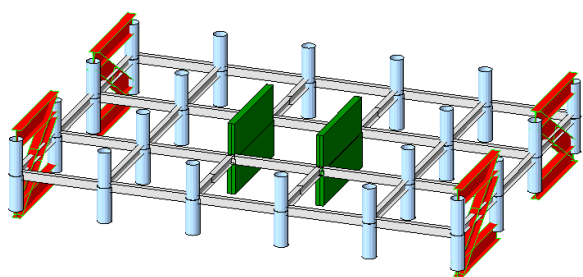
Layout type 2 of offset outrigger system(Outrigger is installed in line 1 and 6)
